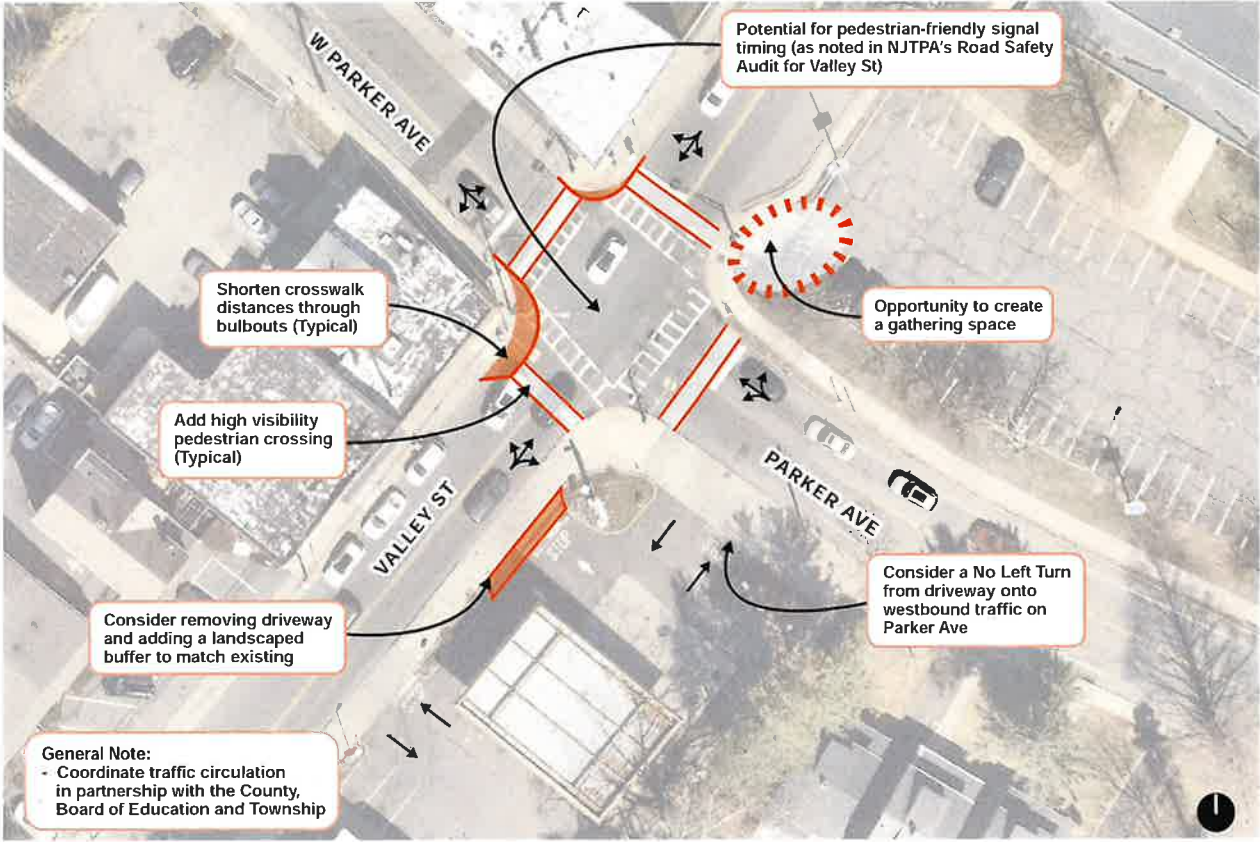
Conceptual Plan for the Intersection at Parker Avenue and Valley Street
